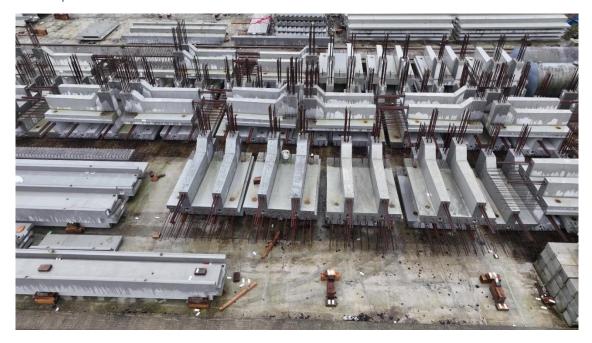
Precast wall sections to be placed on top of uppermost row of box caissons.
